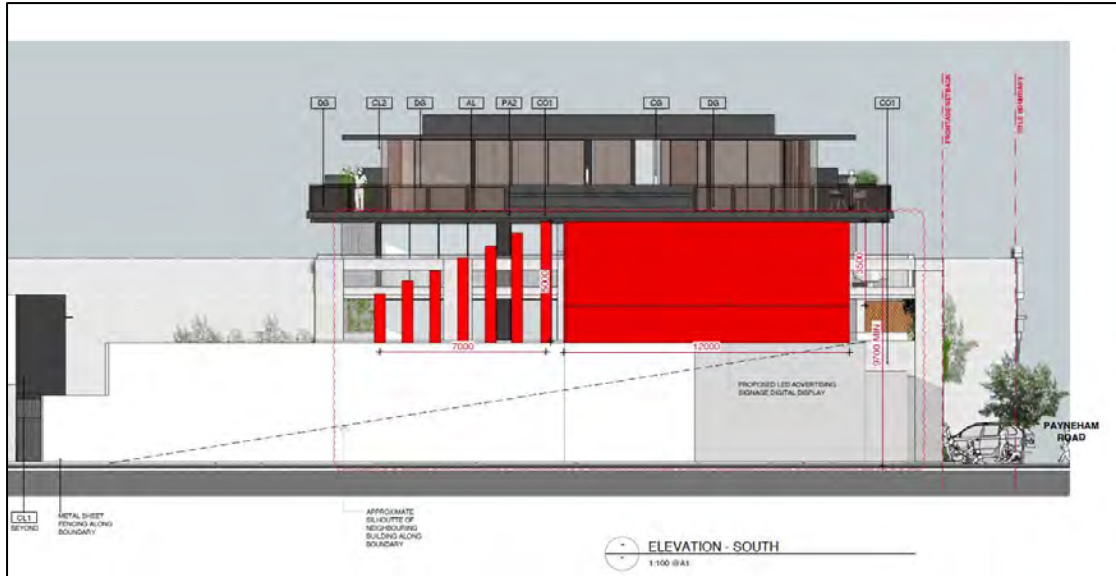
Approved Development 151-157 Payneham Road – South Elevation (showing LED screen)
